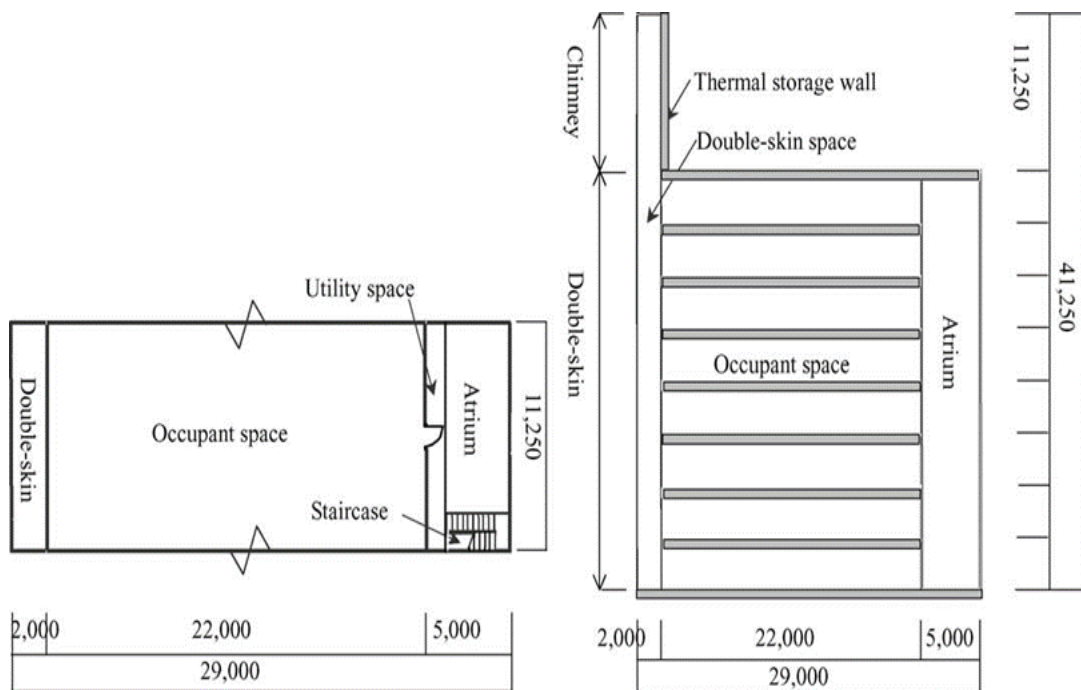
Outline of the prototype building (left: plan; right: section; units: mm). (Ding et al., 2005).
